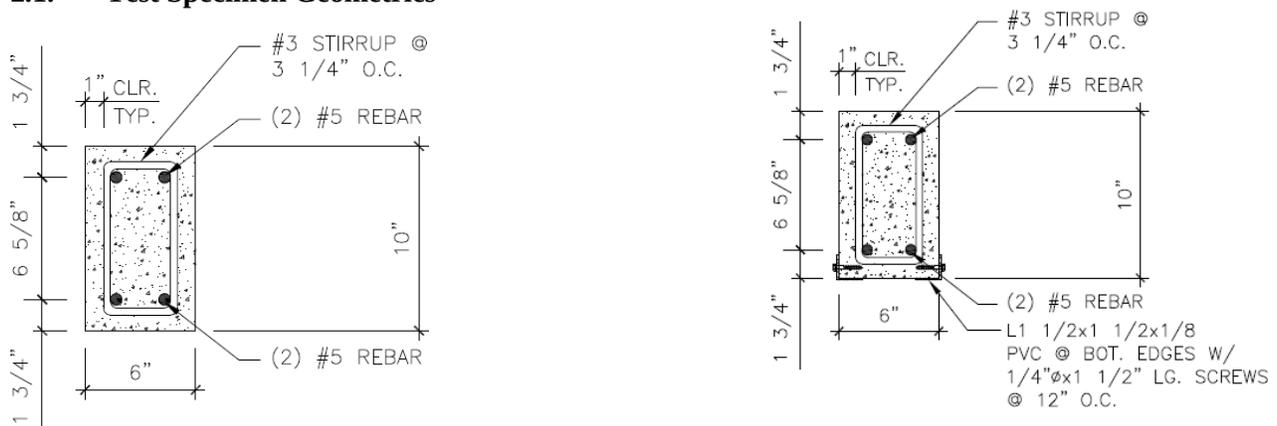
Cross section of (a) Beam 1 and (b) Beam 1R and Beam 2. (1 in. = 25.4 mm)
